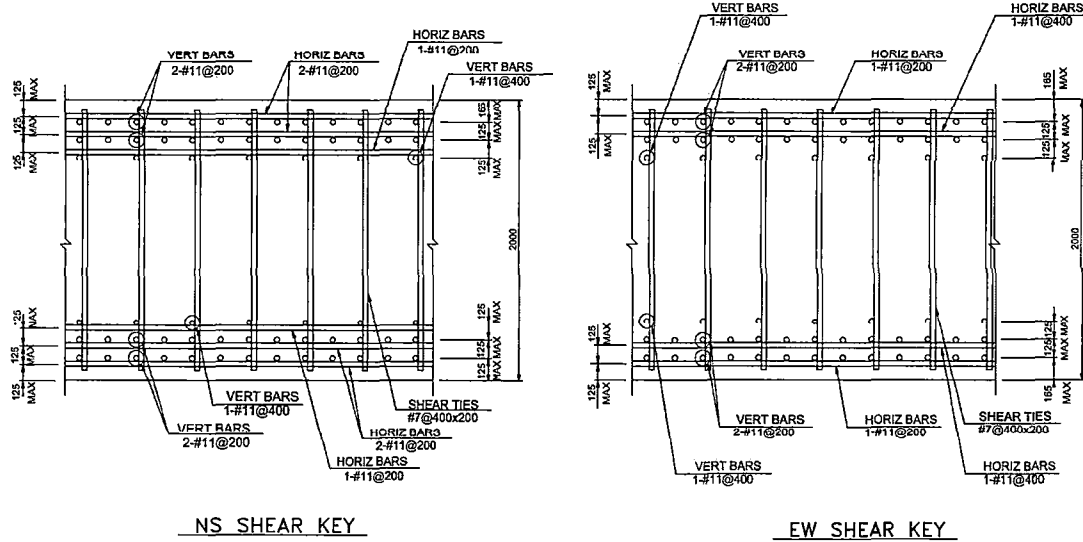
Typical Walls Rebar Arrangement of FPE (unit: mm)
